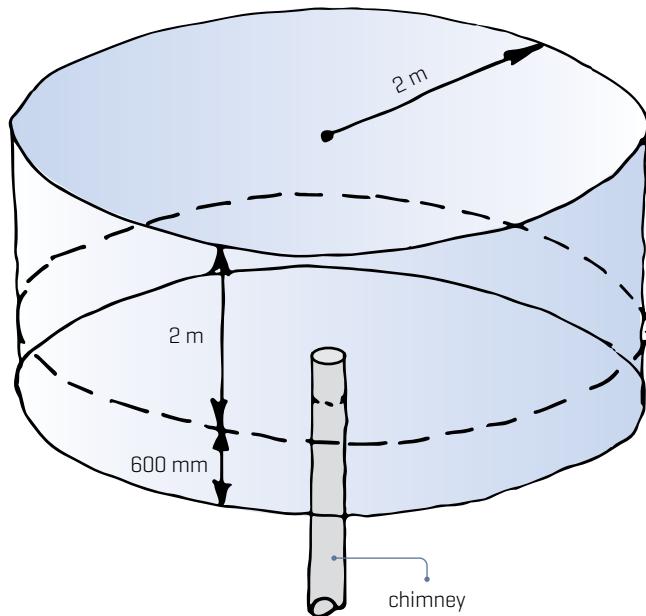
Termination point of vent 2 m above, 600 mm below and 2 m horizontally from a chimney or flue.
